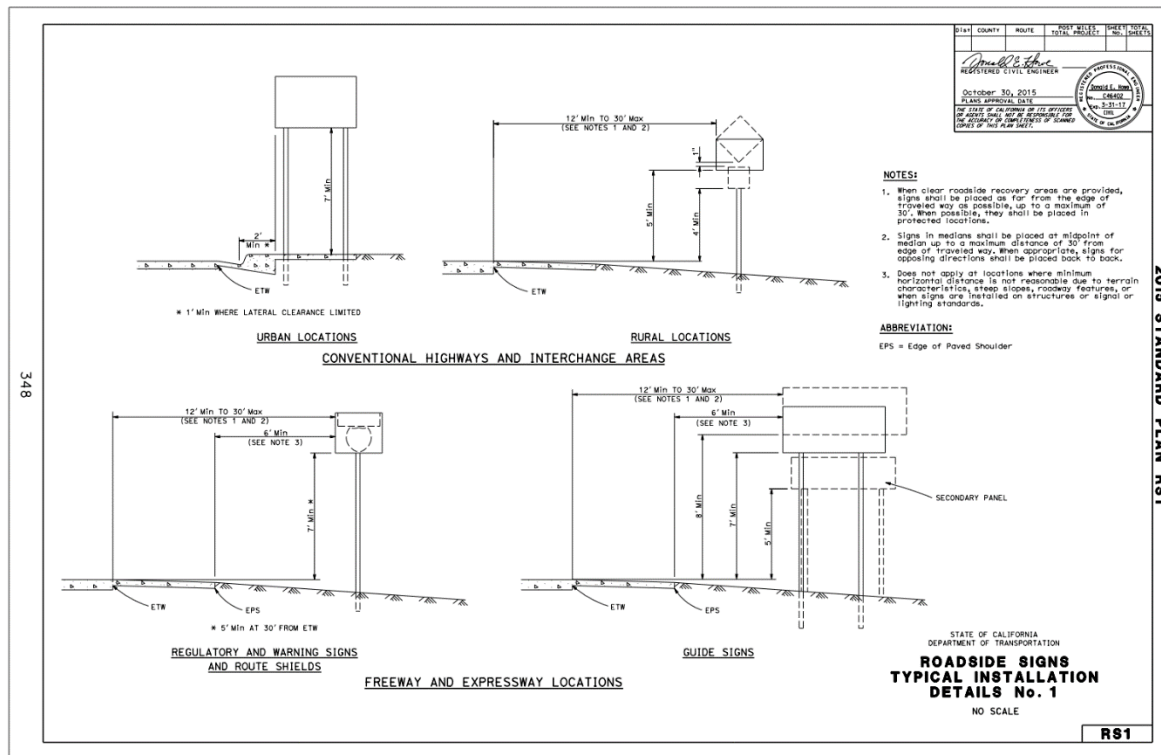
Standard Plan RS1 Roadside Sign Typical Installation [5].
